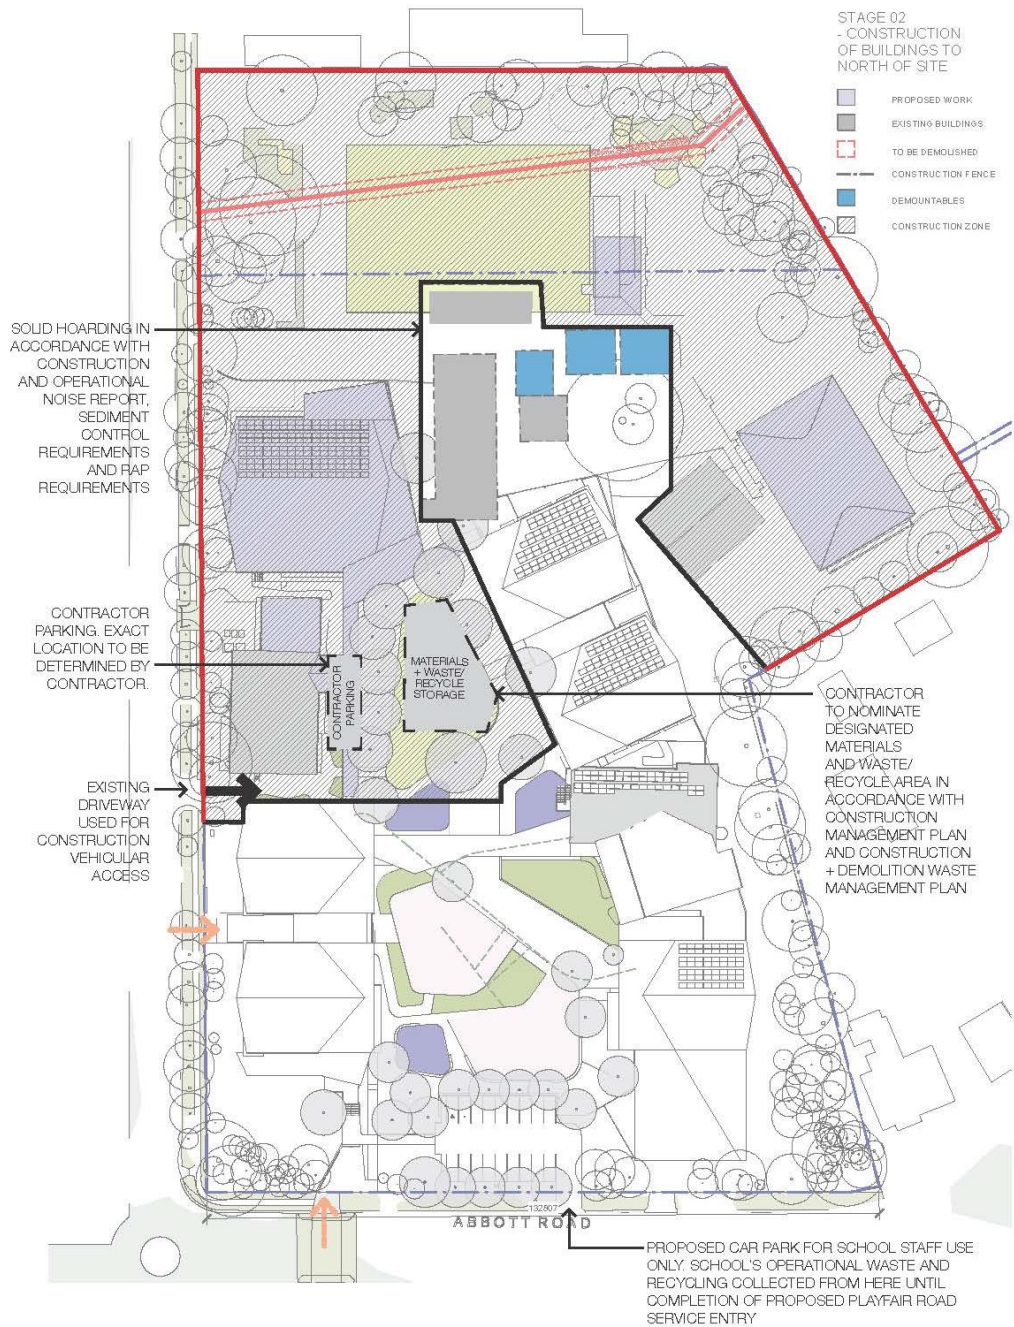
Stage 2 Construction Site Diagram. CONCEPT ONLY - Contractor to prepare final plan
